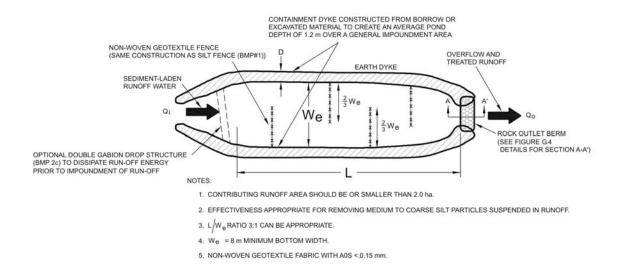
e: Type II Containment Structure (Sediment Trap Plan)
